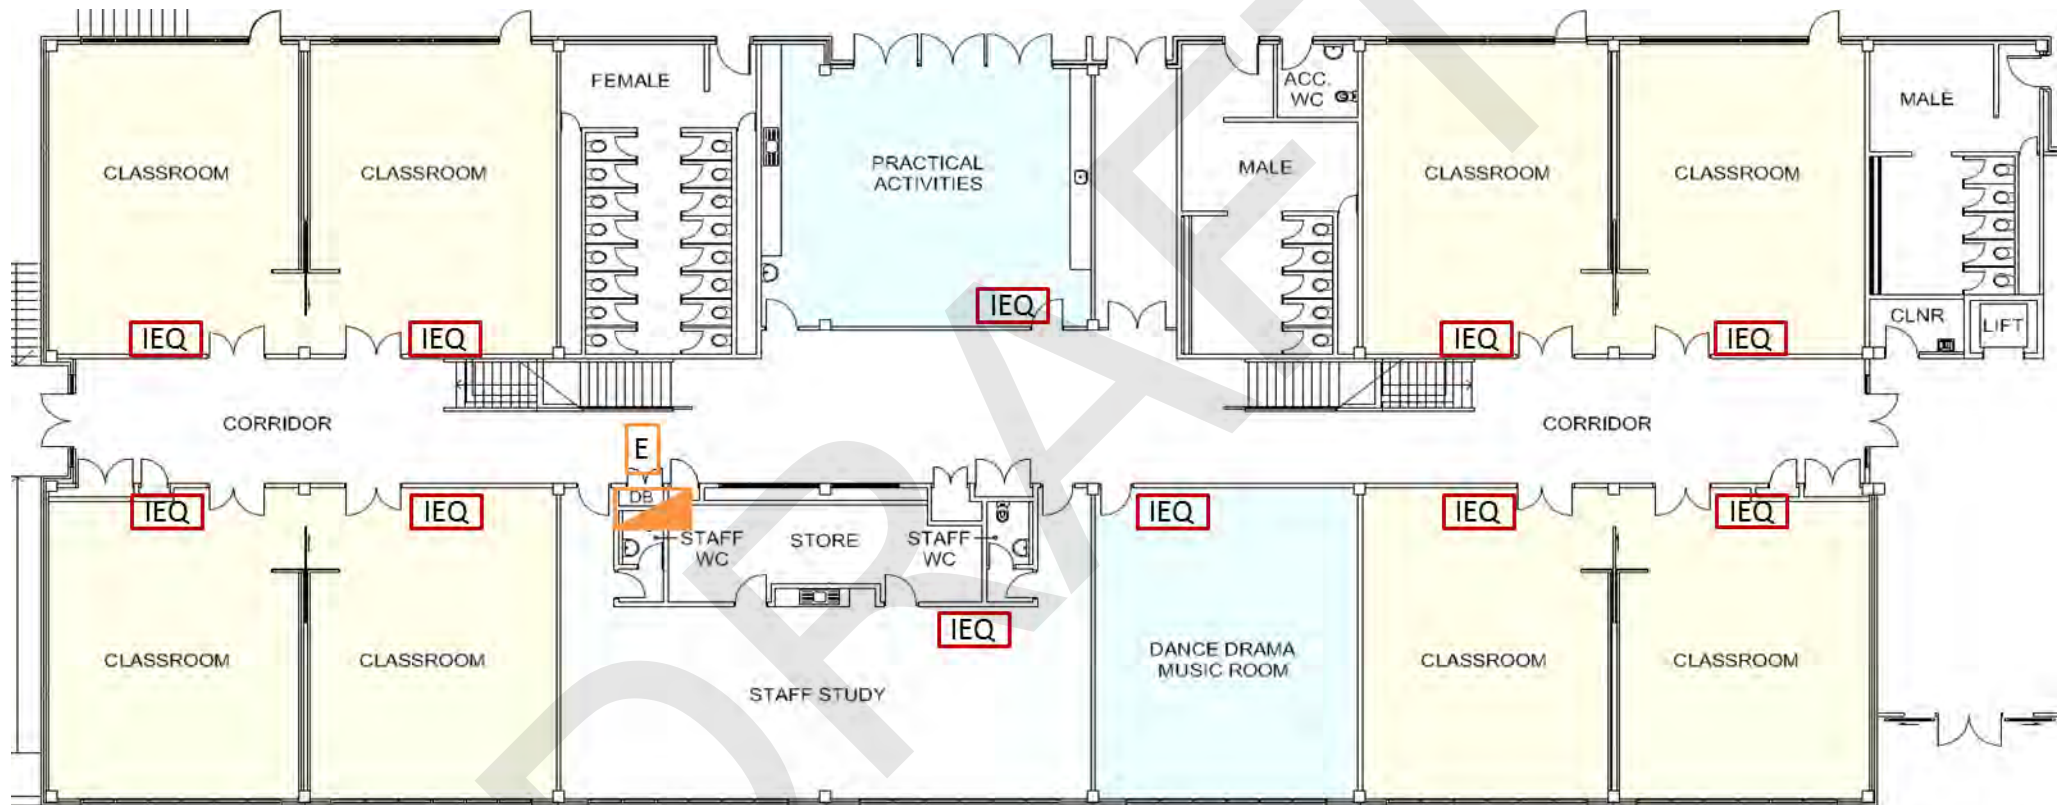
B08 - High school – years 6 to 8 ground floor west -- monitoring layout
